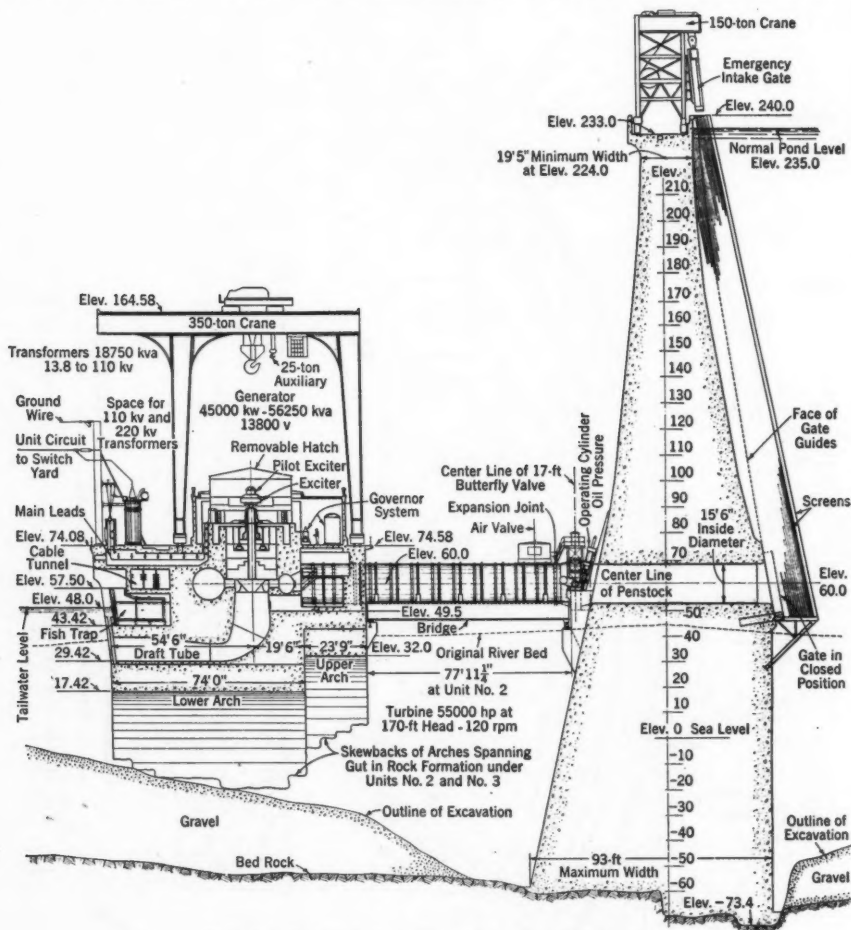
SECTION THROUGH DAM AND POWER HOUSE.
